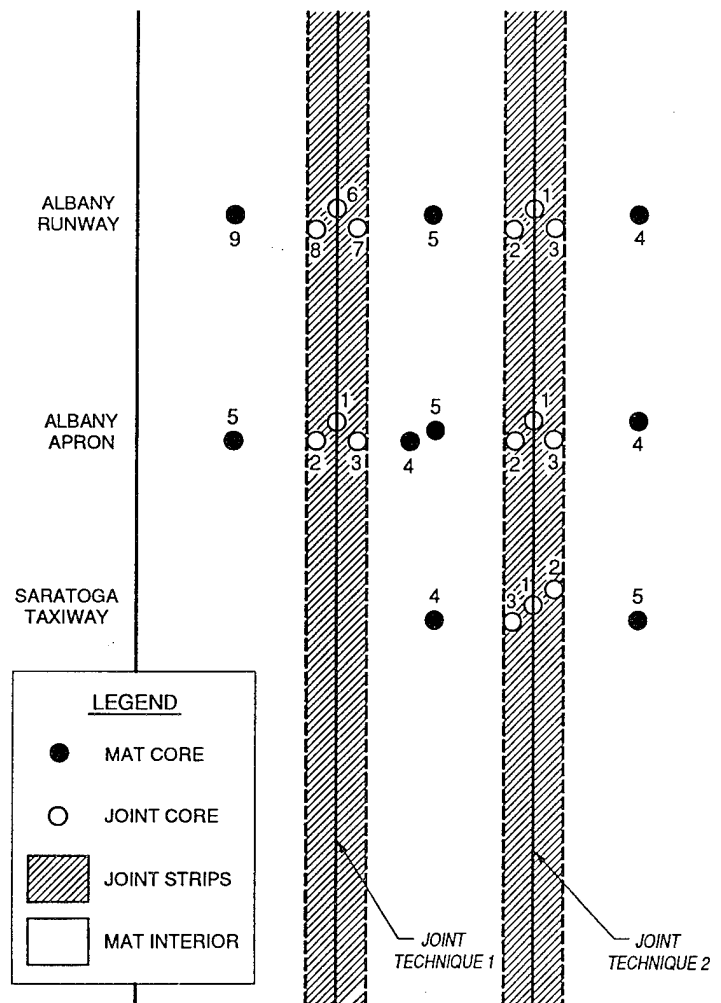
AIRPORT PAVEMENT CORE SAMPLING PLAN
